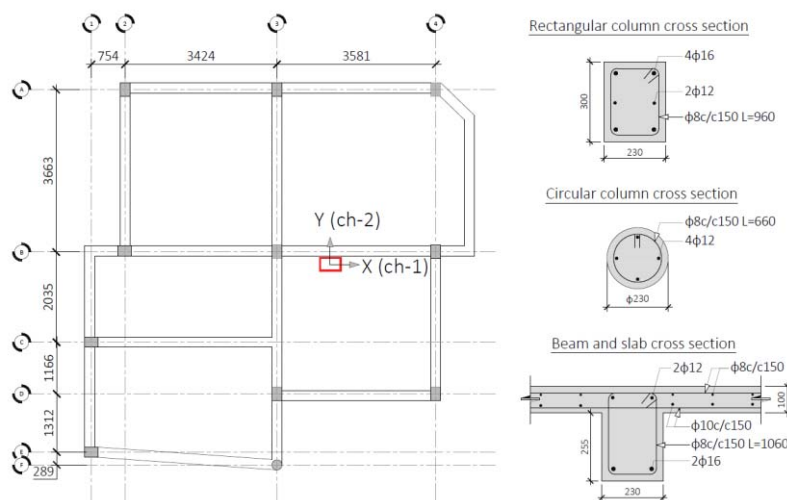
Structural layout of the building showing beams and columns and their cross sections. The red rectangle shows the location of accelerometer and orientation of the instrument sensor axis are indicated with the arrows.
